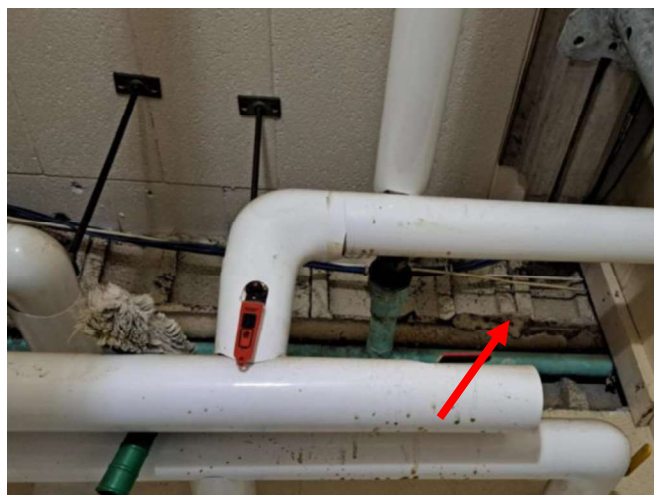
View of the concrete block wall during the vermiculite investigation and drilling activities (see arrow) within Classroom 8 of the 1962 section of the Subject Building.
